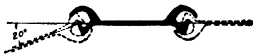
Lackawanna steel sheet piling (Lackawanna Steel Co.).
